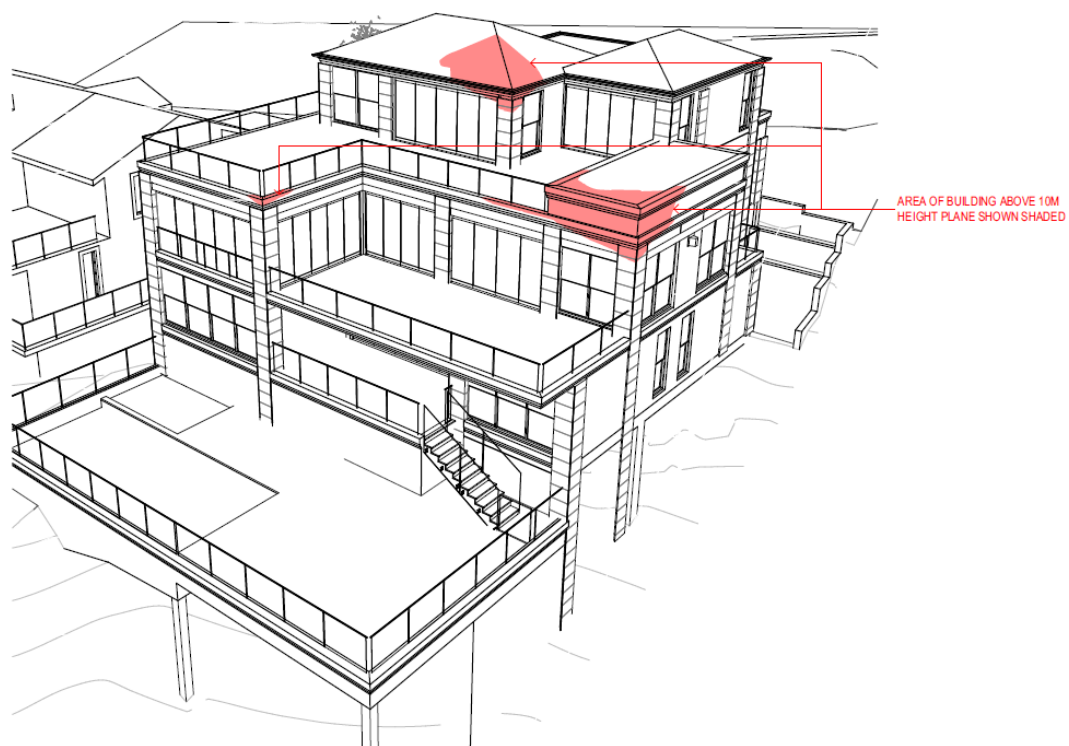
Plan extract to indicate area of dwelling exceeding the 10m height control as the site exhibits a slope that is in excess of 16.7 degrees or 30%
